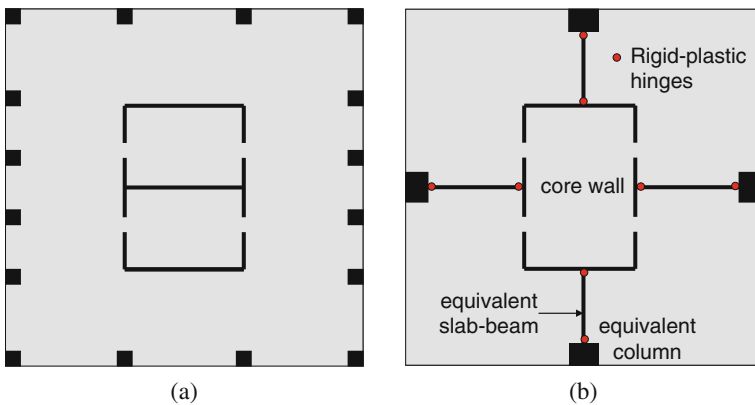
Slab column layout and slab column modeling. (a) Floor plan. (b) Simple model
